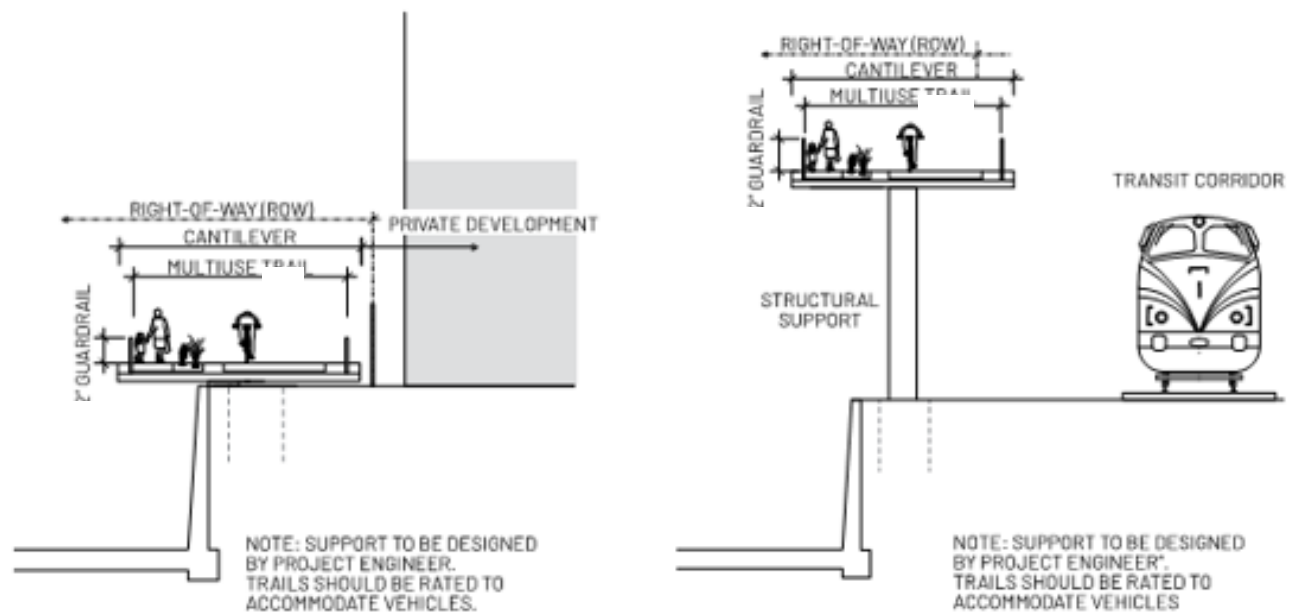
Example Cantilever and Elevated Multiuse Greenway Sections (NTS)
